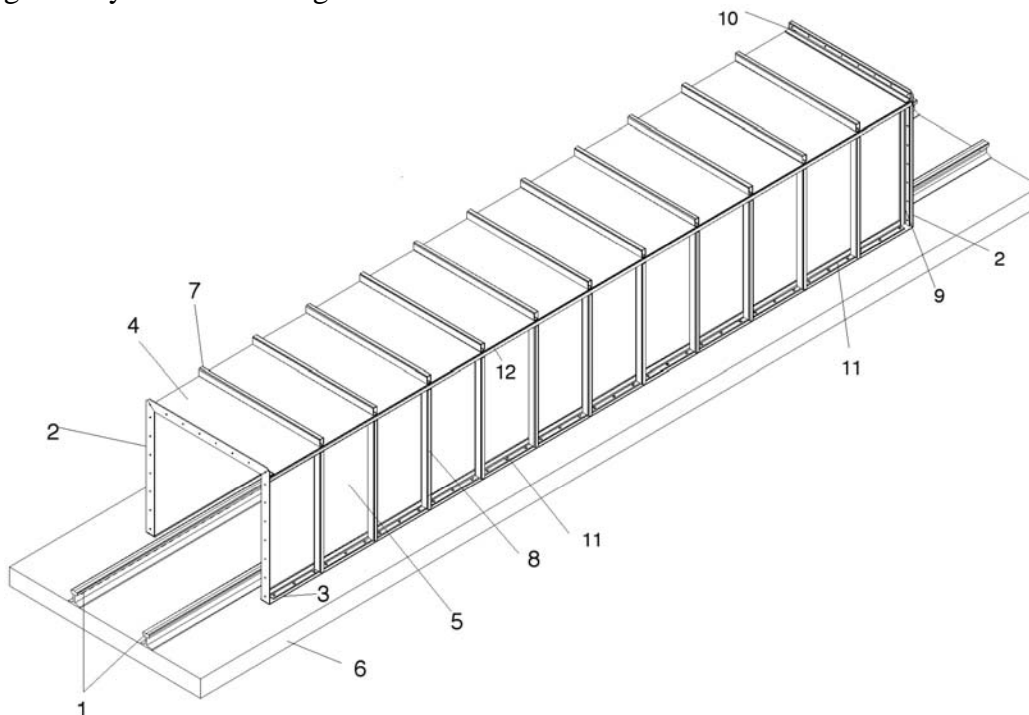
Rail-in-tube conduit made of steel frame and concrete floor for above-ground PCP
